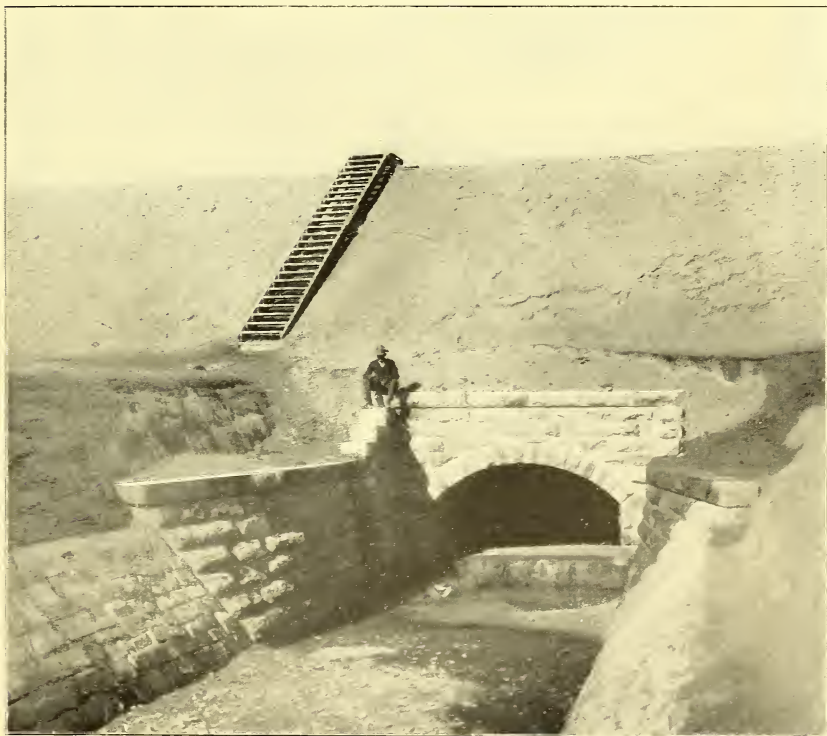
OUTLET CONDUIT NO. 2, GREAT PLAINS WATER COMPANY.
